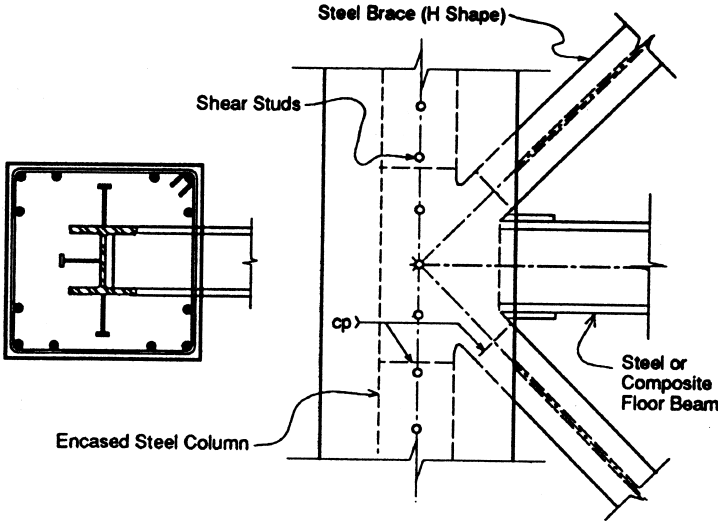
Reinforced concrete (or composite) column-to-steel concentric brace.
